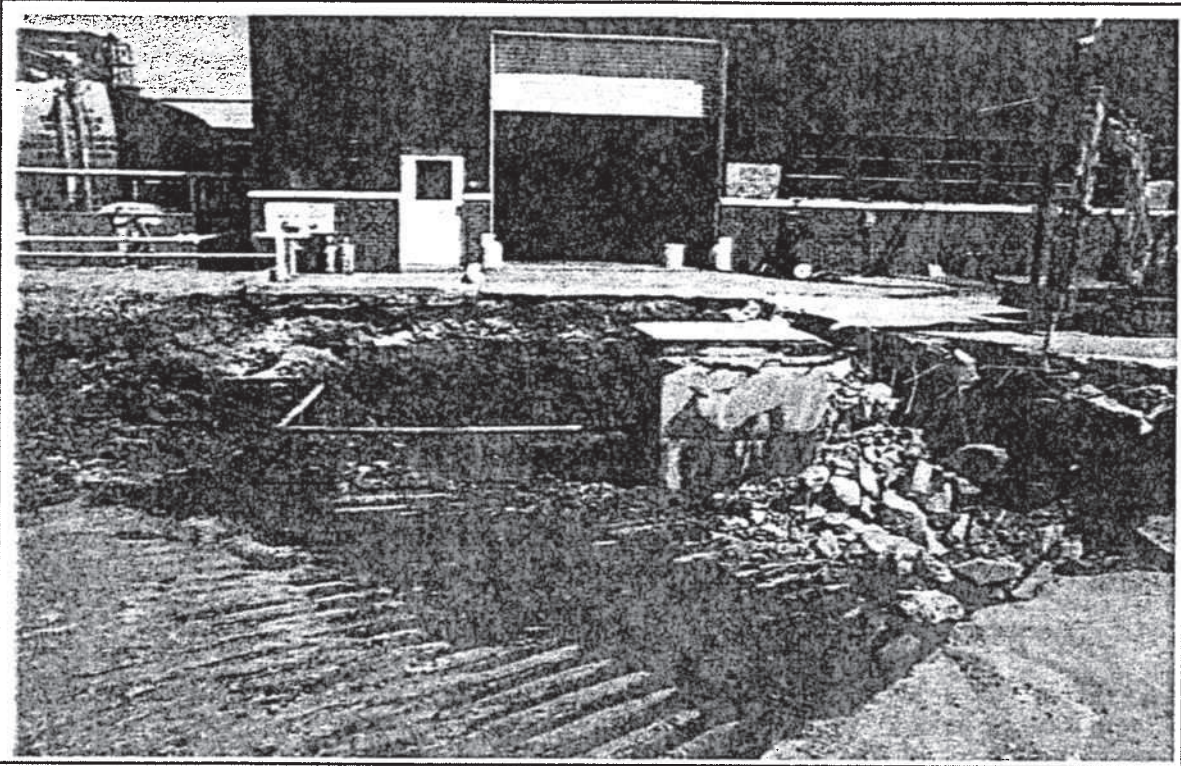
Looking north at backfilling of main excavation. Removal of spill containment pad underway.
